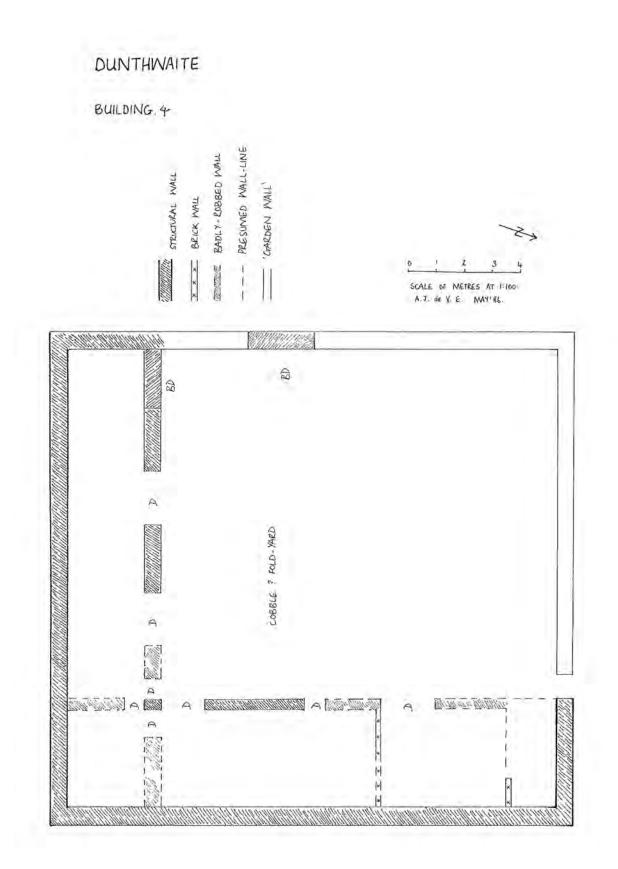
1986 survey, Building 4 (now 8) plan (Higgins 1986).
